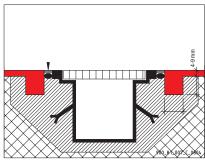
DETAILING AND JOINTING FOR FLOORING APPLICATIONS
